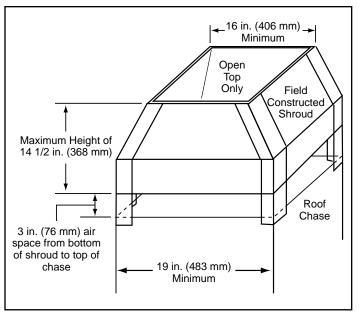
Minimum Dimensions of Shroud & Chase for TS345
